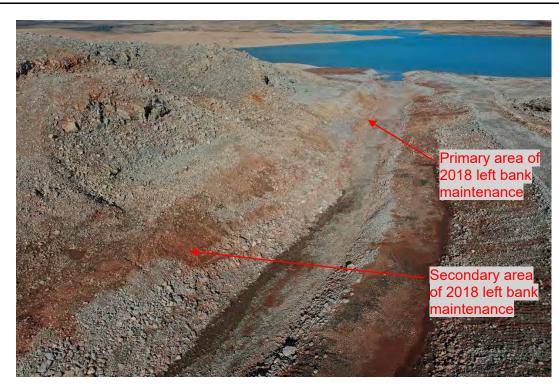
West Twin Dyke Spillway – UAV overview of left bank erosion downstream of the spillway access ramp.
